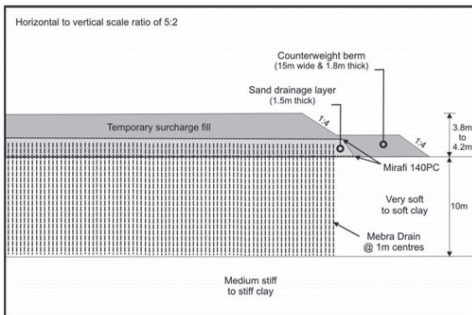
Typical cross-section showing use of prefabricated vertical drains and geotextile separator at New Bangkok International Airport Project, phase 2.
